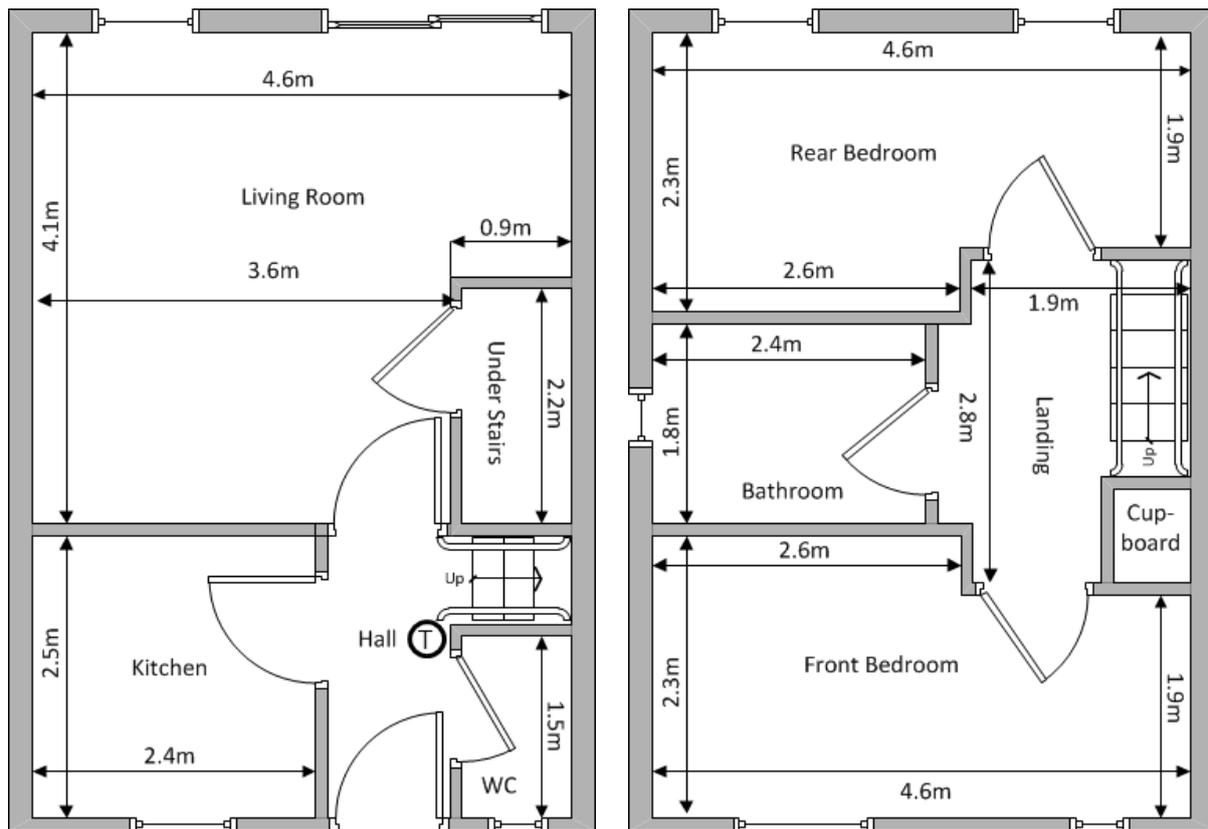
Floor plans of the Holywell test house ground floor (left) and first floor (right). The thermostat is shown by circled T in the hall.
